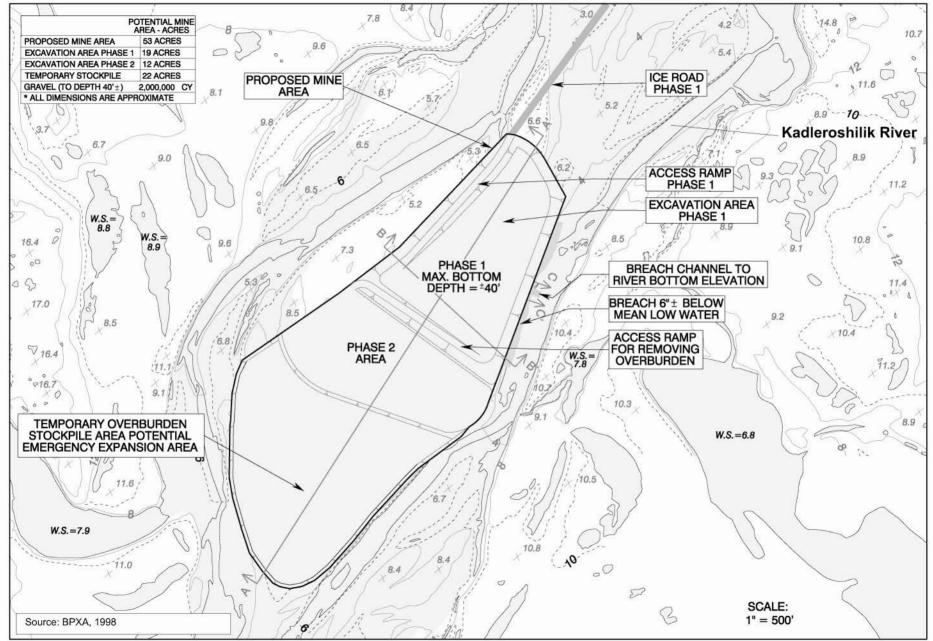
Proposed Kadleroshilik River Mine Site - Phase I - Plan View
